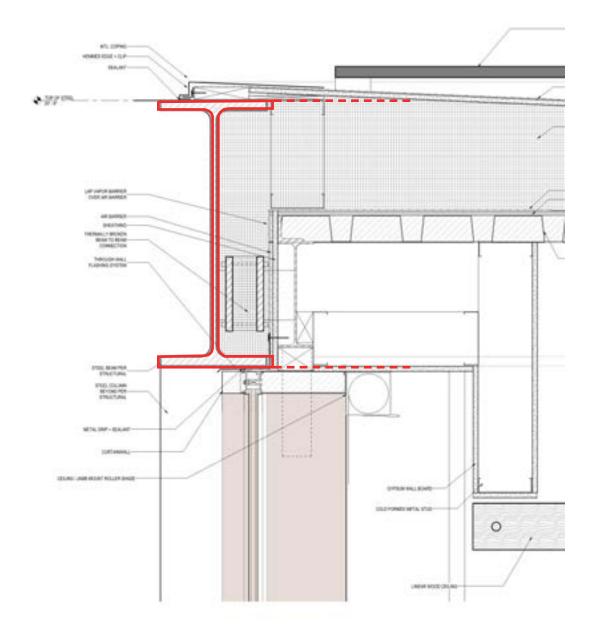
DETAILING AND CONNECTIONS AT SOLAR CANOPY & HISTORIC BUILDING
